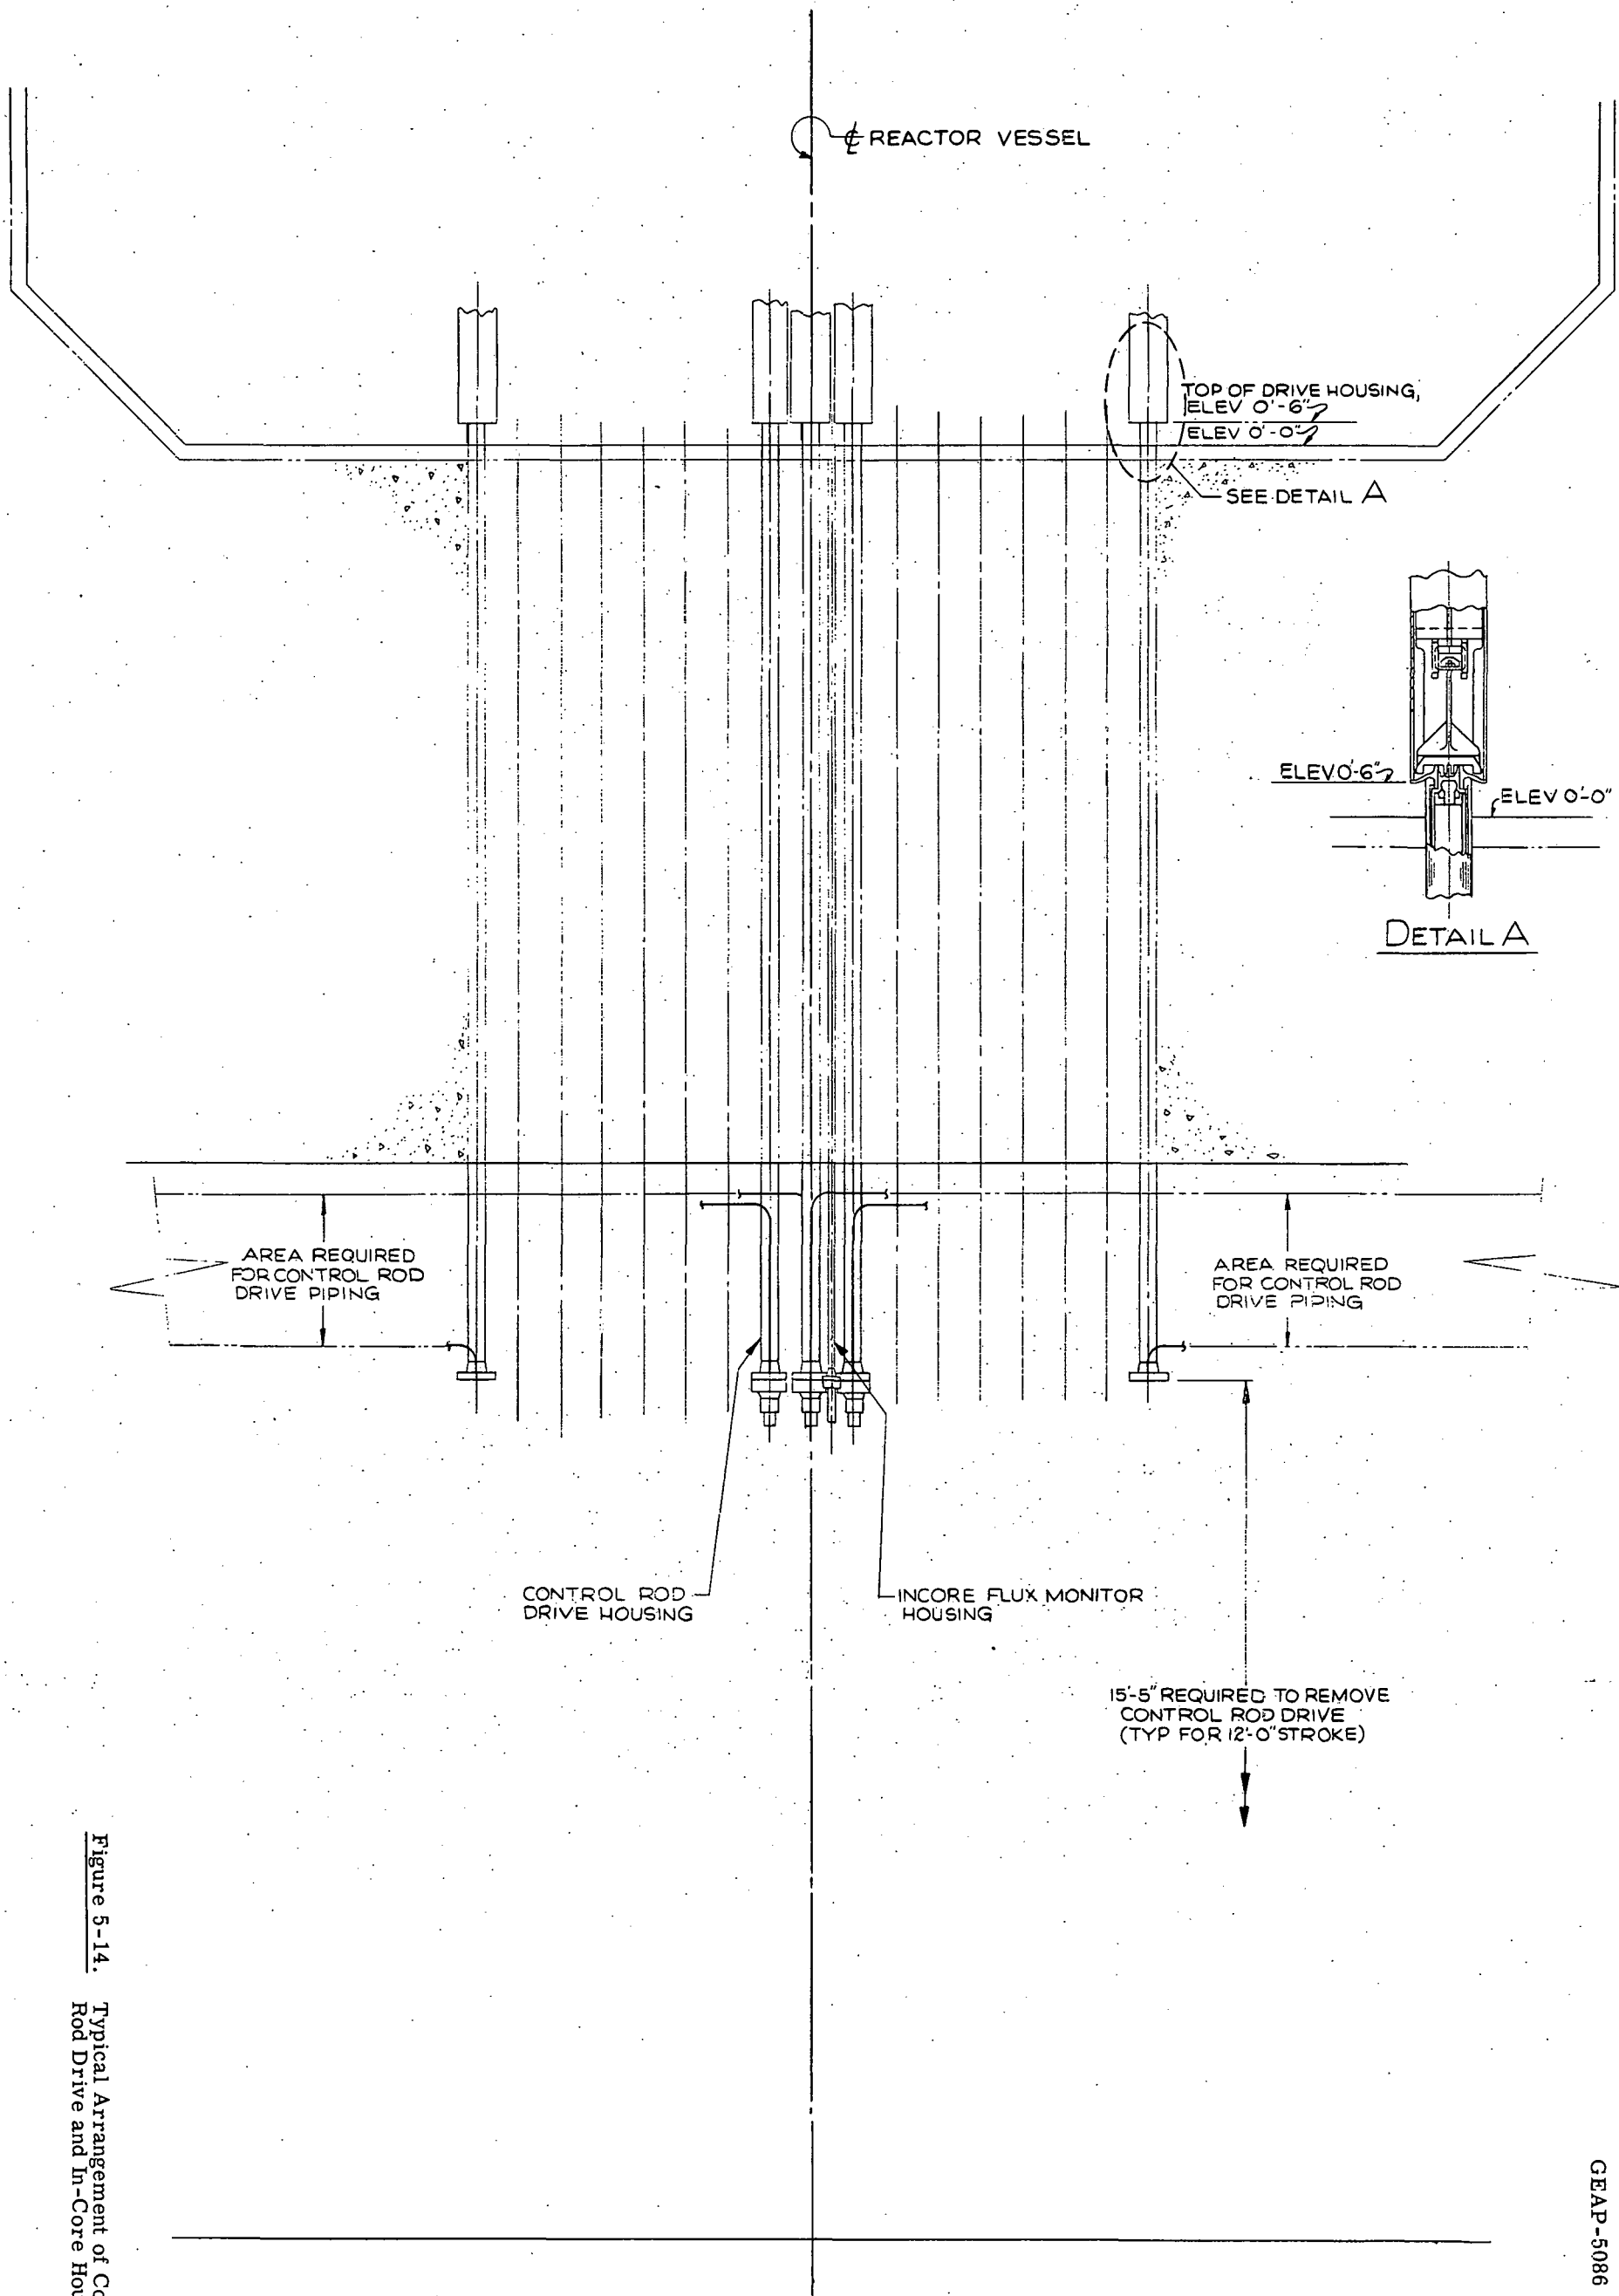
Typical Arrangement of Control Rod Drive and In-Core Housings.
